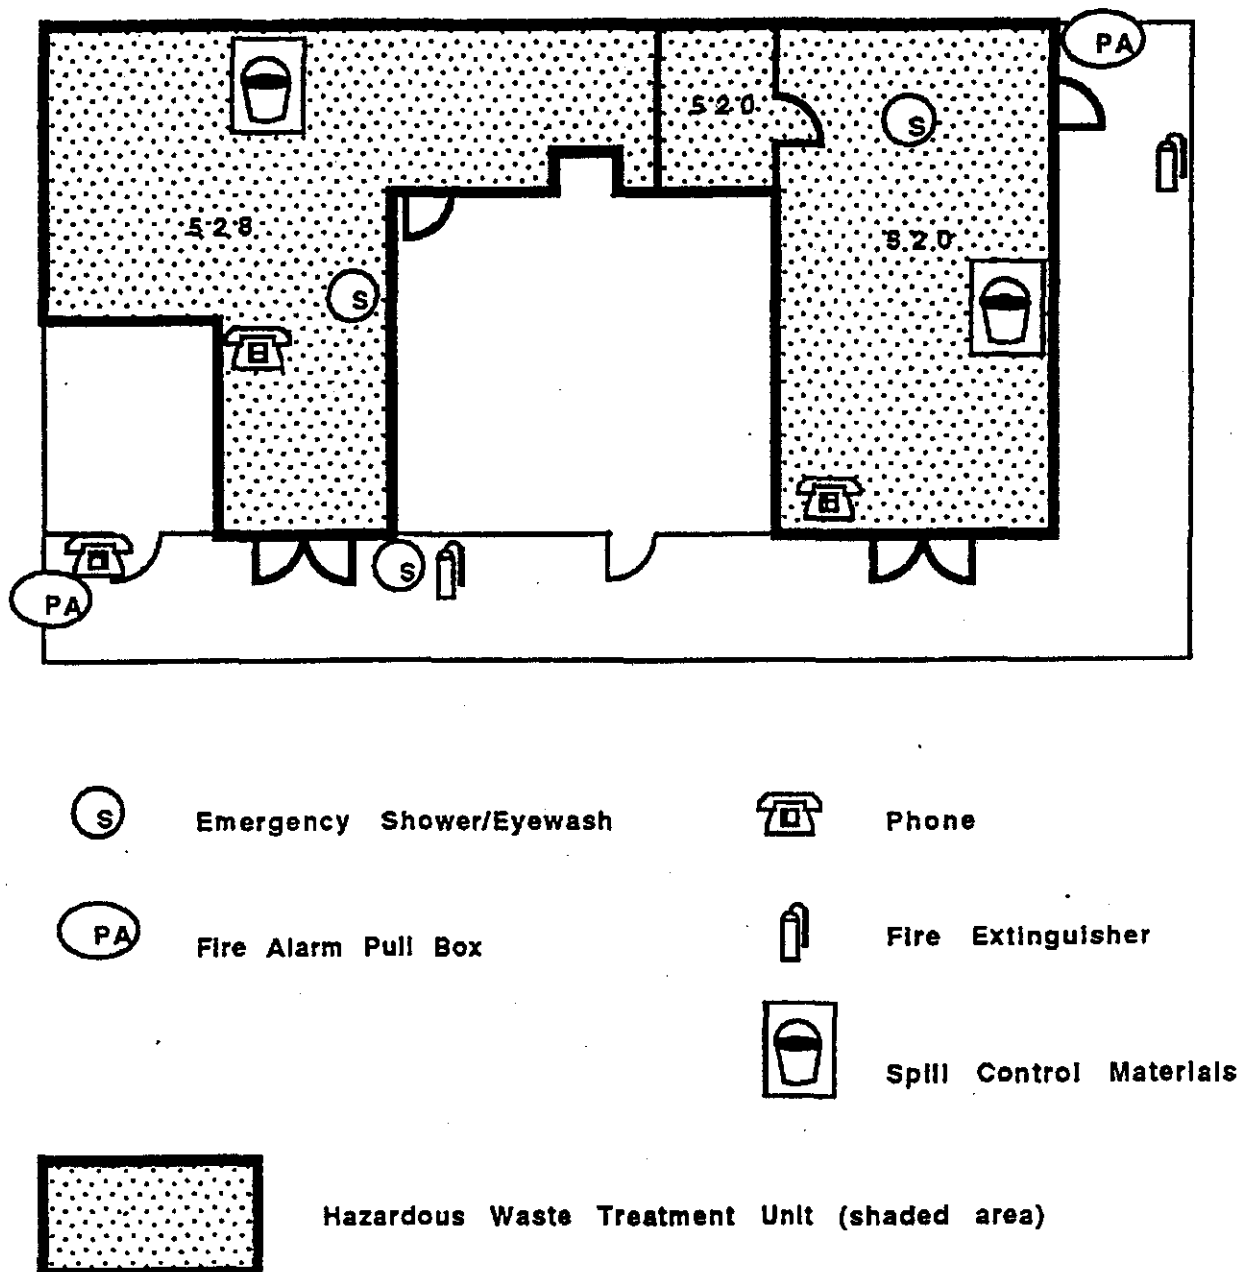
Locations of Emergency Equipment at the Shielded Analytical Laboratory (First Floor)
